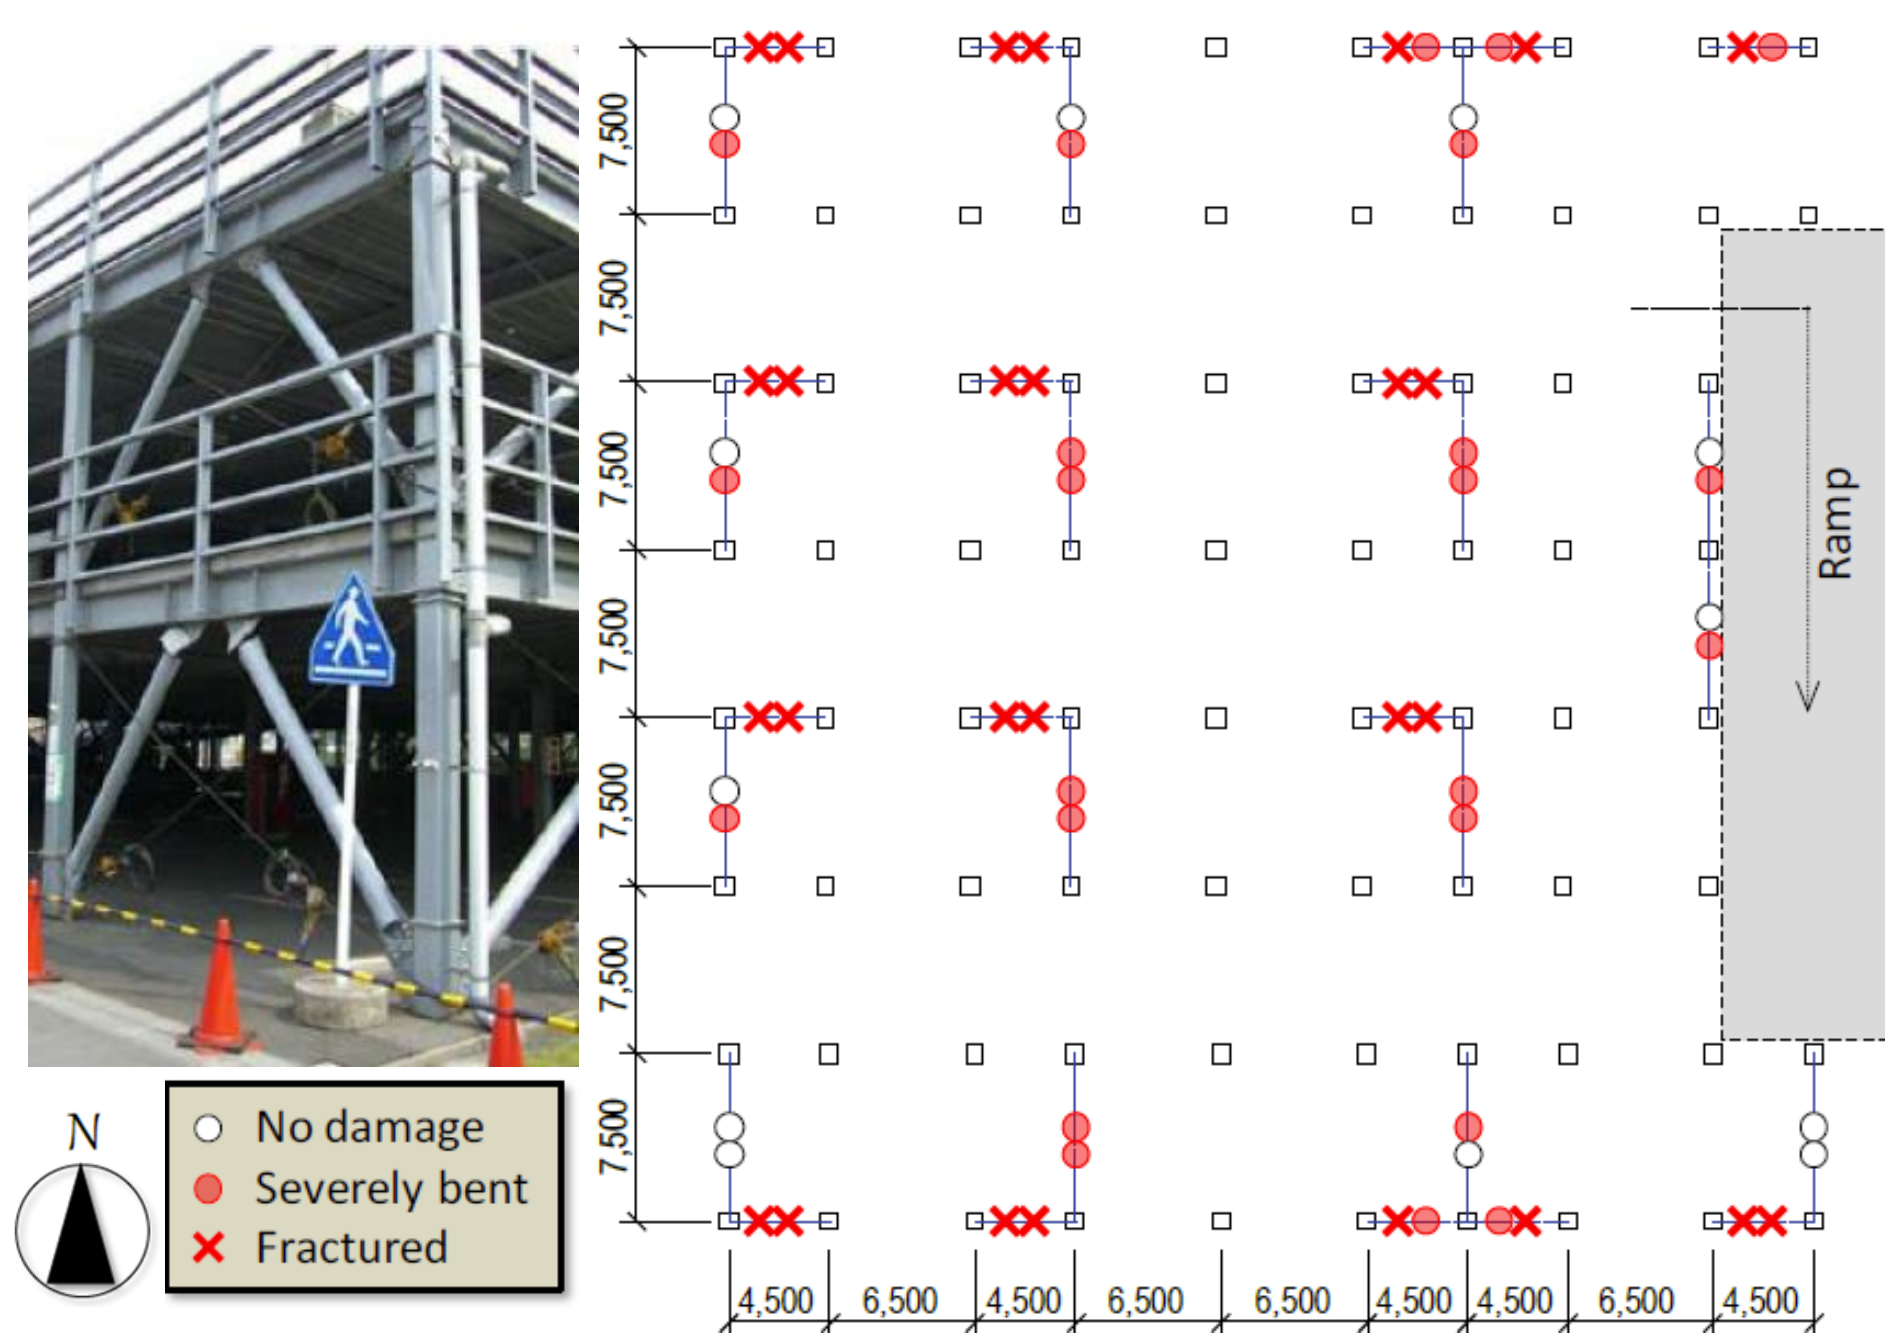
Damaged parking ramp and plan indicated damage location for the first story
